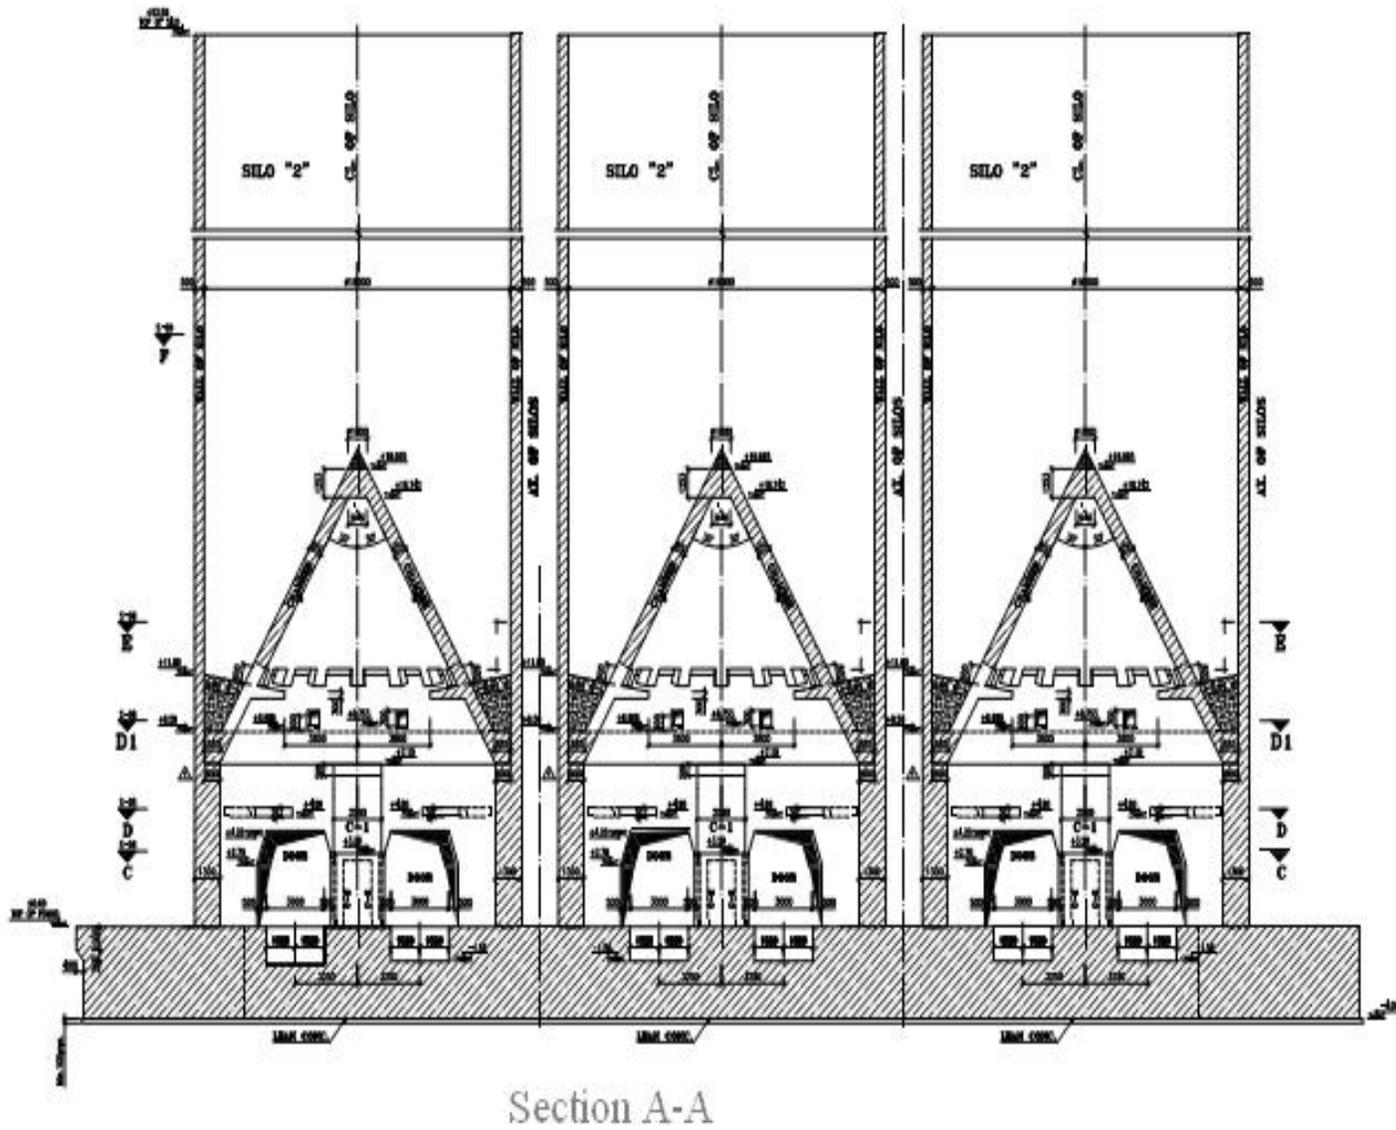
A Cross-sectional detail of Delijan’s cement storage Silo Structure and its Foundation
